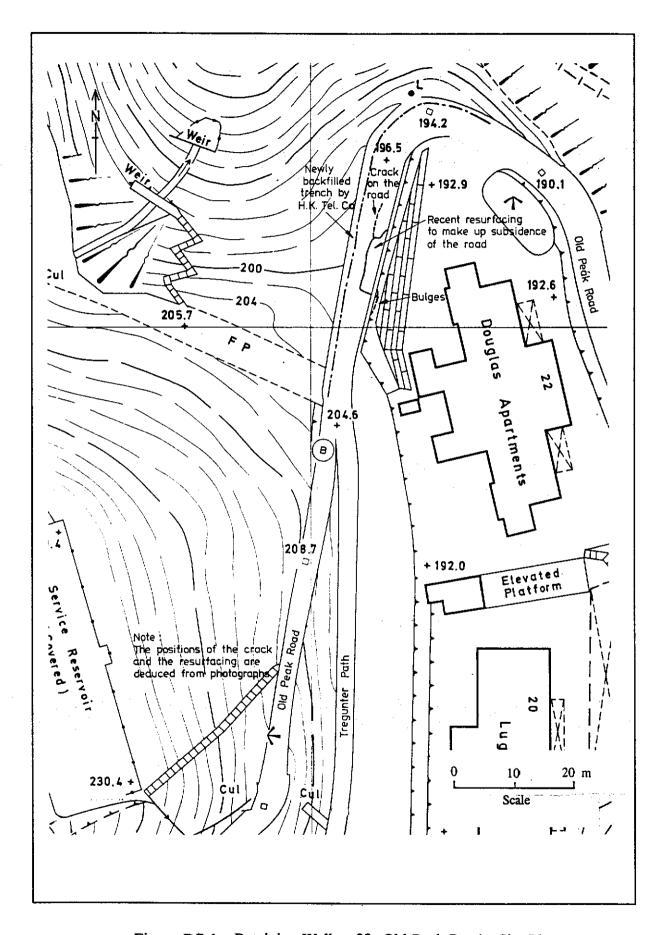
Retaining Wall at 22, Old Peak Road - Site Plan
